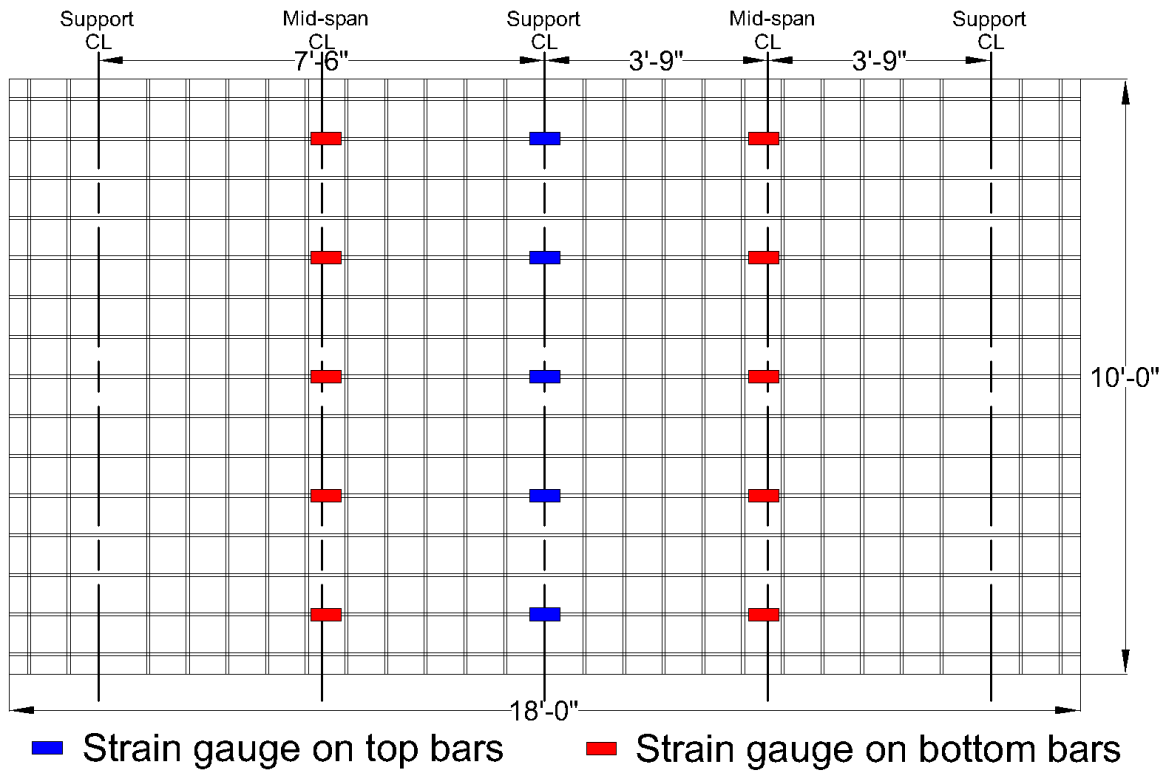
Instrumentation plan for bridge deck Prototype 6.
